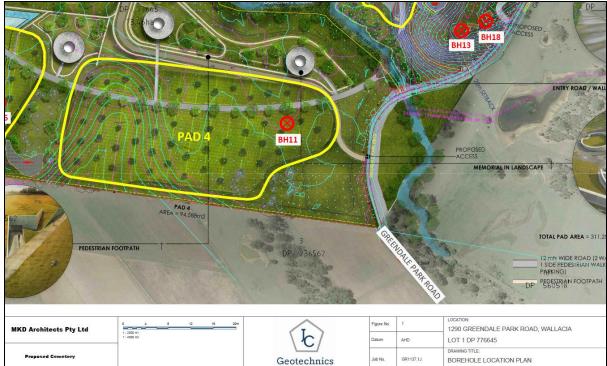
Extract of Borehole Location Plan confirming the location of BH11.
